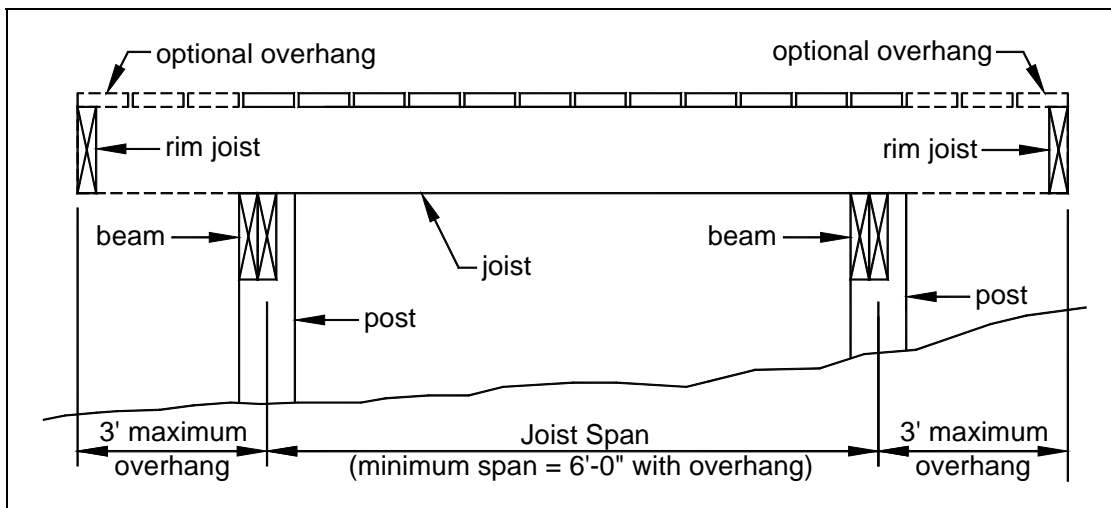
JOIST SPAN - FREE-STANDING DECK
